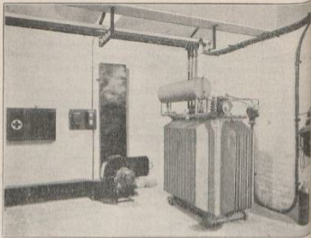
Underground Substation 500 K.V.A. Transformer and Ventilating Fan.
